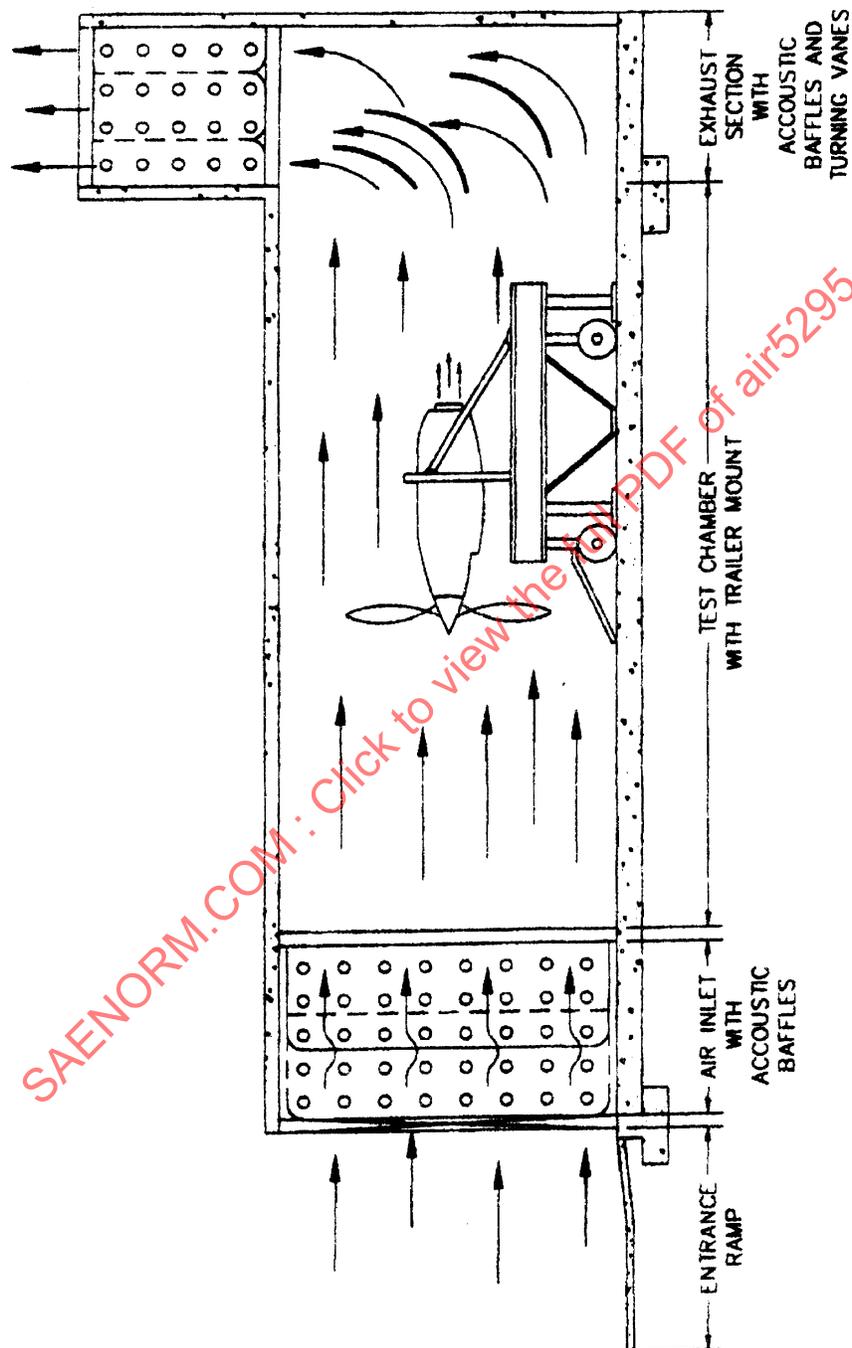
Turboprop Engine Test Cell With Horizontal Inlet and Vertical Exhaust Sections Without Inlet Courtyard or Orifice Wall
